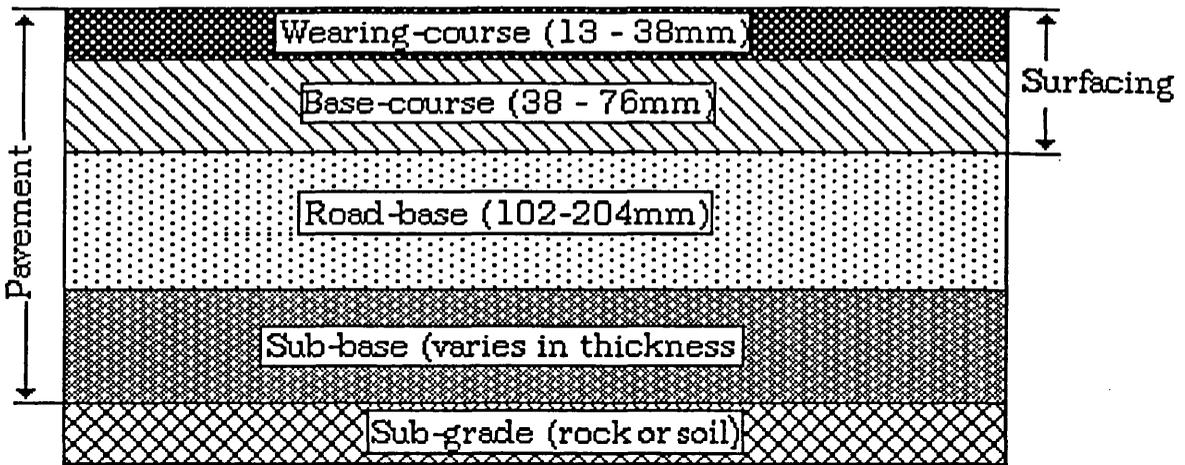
Cross-section of a typical highway. (after Harris, 1977)
